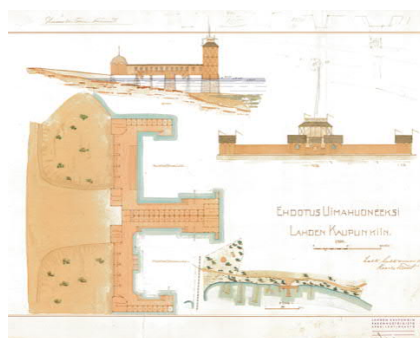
The earliest plan, a “proposal for a bathing room” (Lahti 2018)
